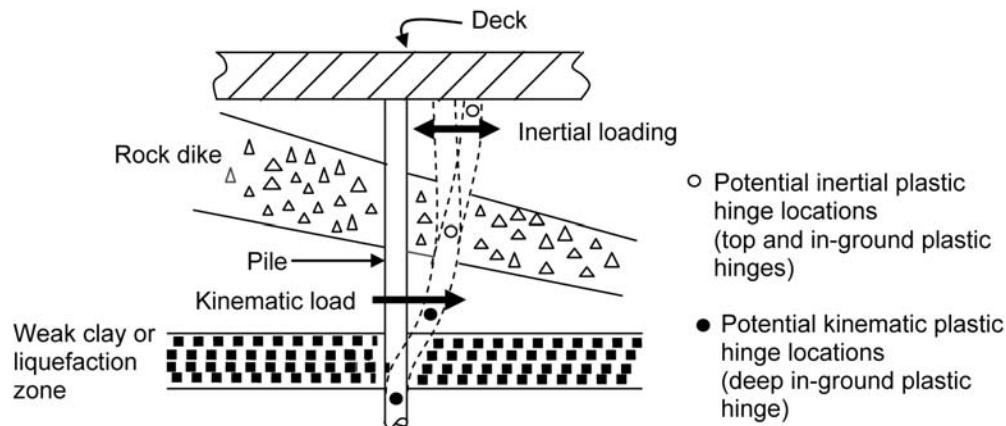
Schematic cross section of pile-supported deck and foundation showing plastic hinge formation due to kinematic and inertial loads (Port of Long Beach, 2009)
